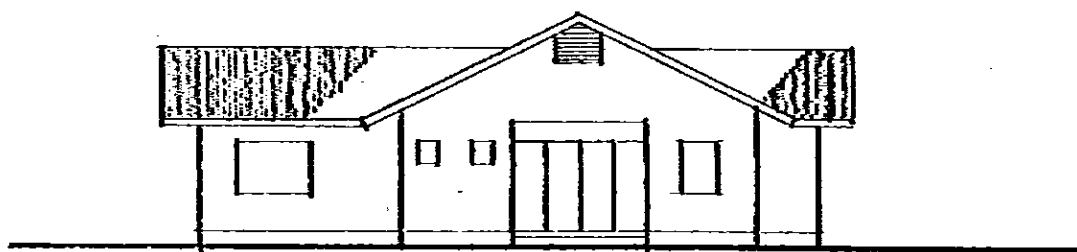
Floor Plan and General Drawings of Pest Observatory Unit
